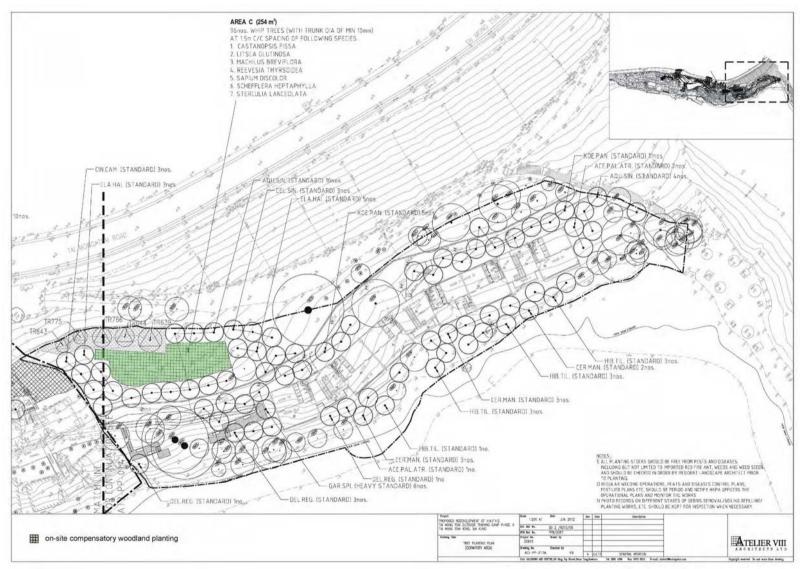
On-Site Compensatory Woodland Planting Plan - Schedule of Drawings (cont.)
